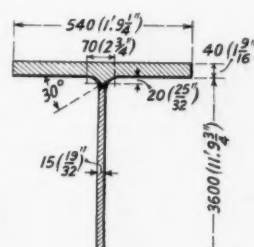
(right)—Dimensions of welded main girders for the Rügendamm bridge
